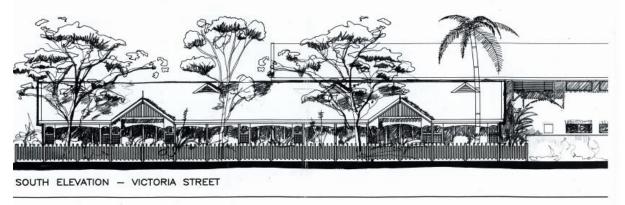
Southern elevation of approved motel units fronting Victoria Street (note 28 Victoria Street is not shown on the right)
